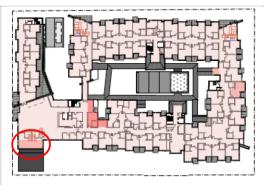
Additional GFA at first floor level, staff room addition circled in red (Source: IDG)
